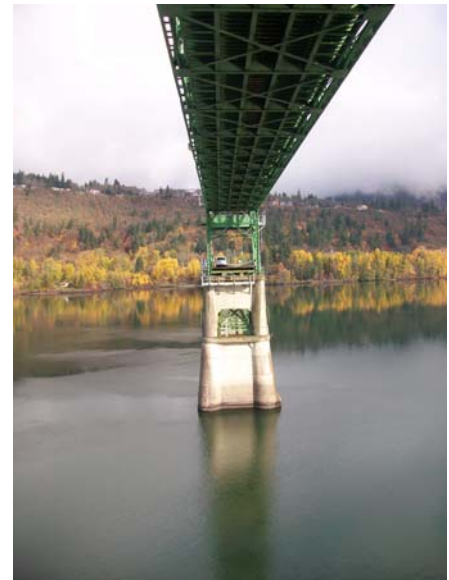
Typical lift-span pier (Pier 12) visible during a bridge lift.
